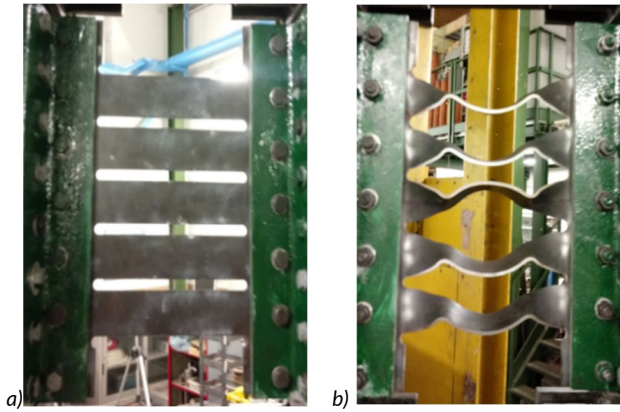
Photo of Specimens A2: a)Start of the test,b) Fracture-end test
